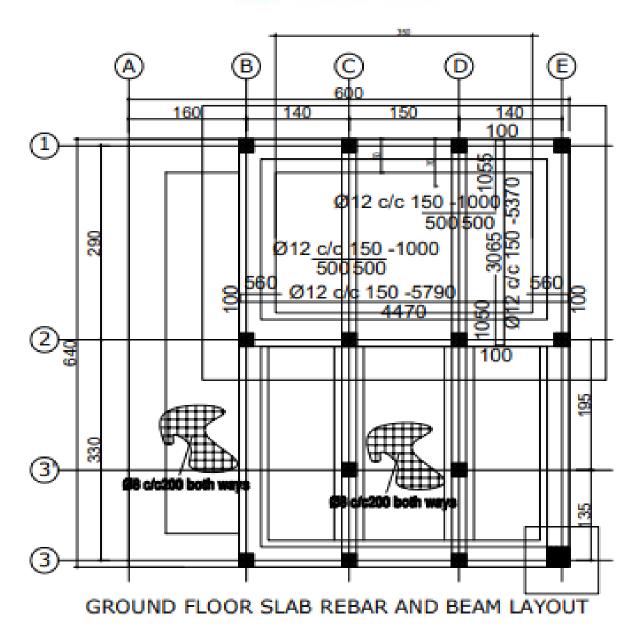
7 Ground floor slab rebare, beam and columun layout
